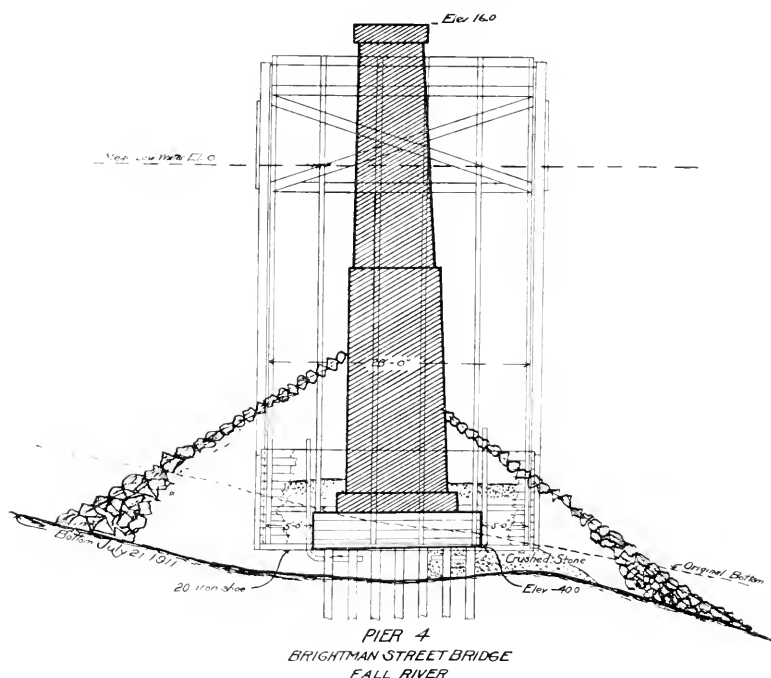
COMPLETED REPAIRS AT PIER 4.
